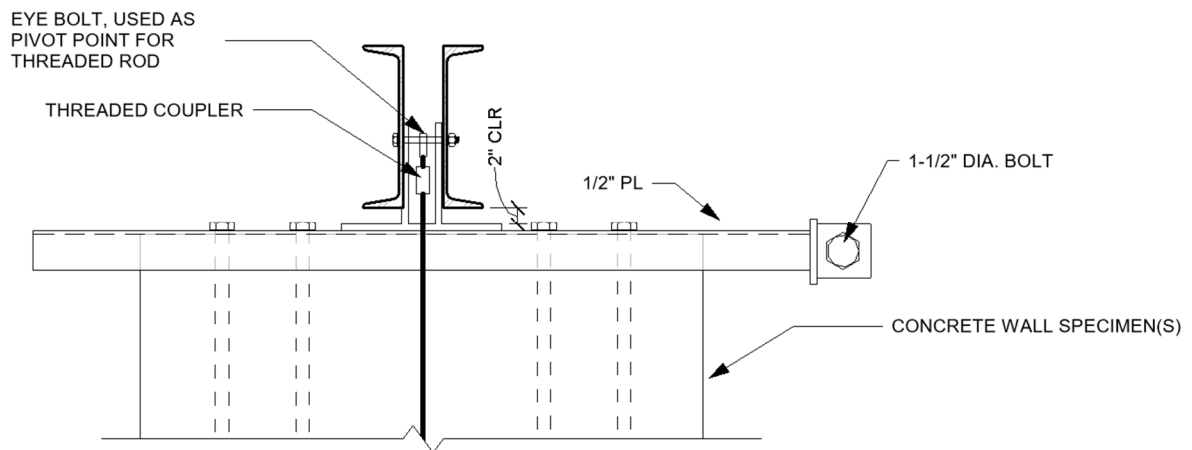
Cal Poly Test Wall Foundation [14]
